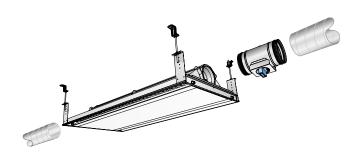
Suspension variant with mounting strips and threaded rods respectively.
